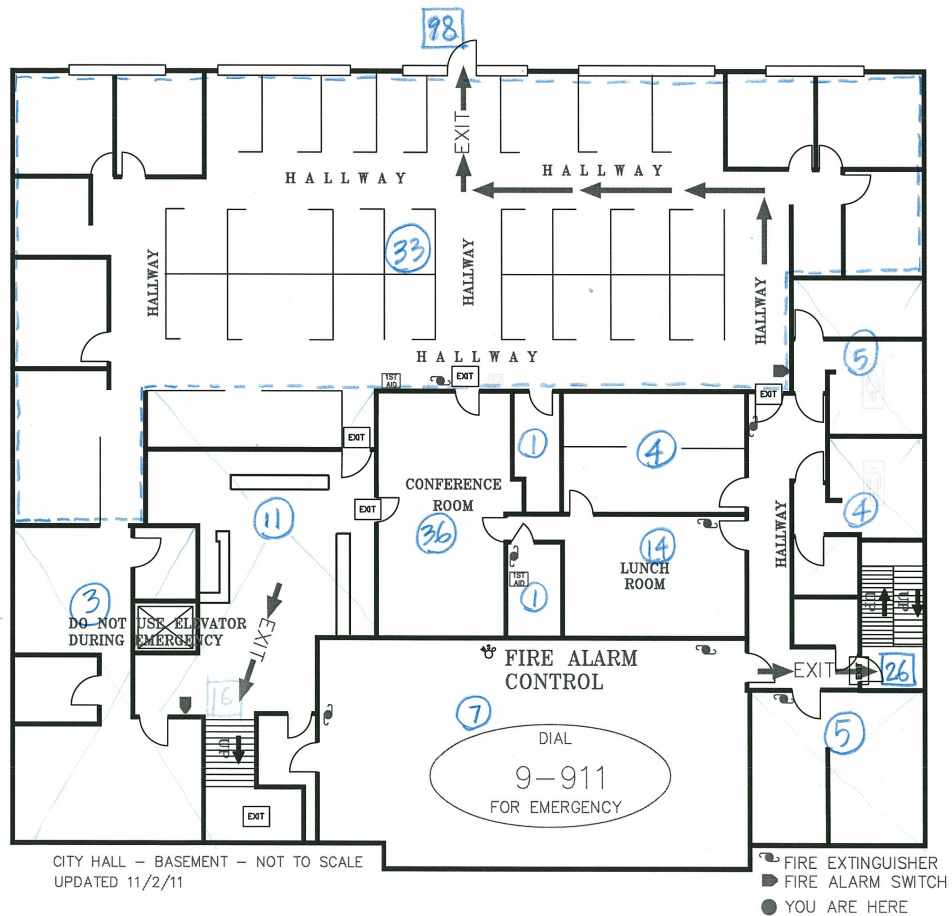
D Basement Floor Occupancy Load and Exit Diagram
